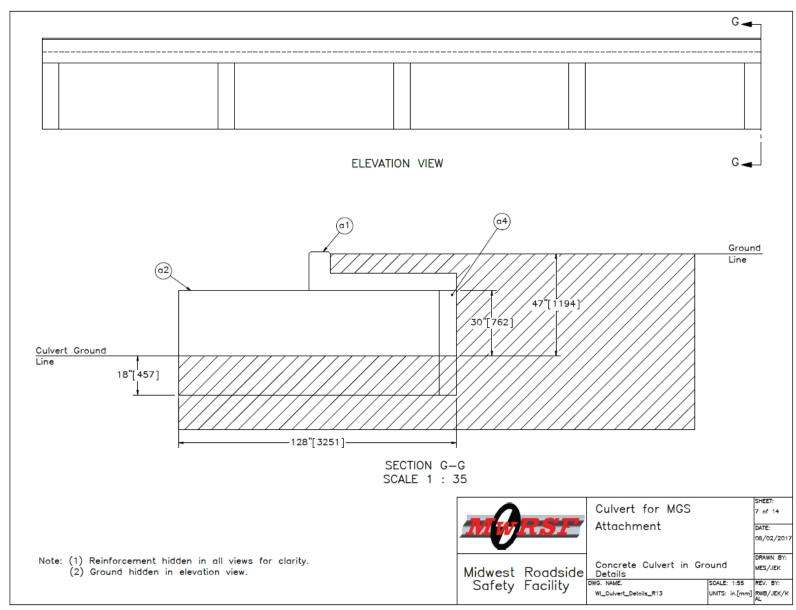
Concrete Culvert in Ground Details, Test Nos. CMGS-1 and CMGS-2
